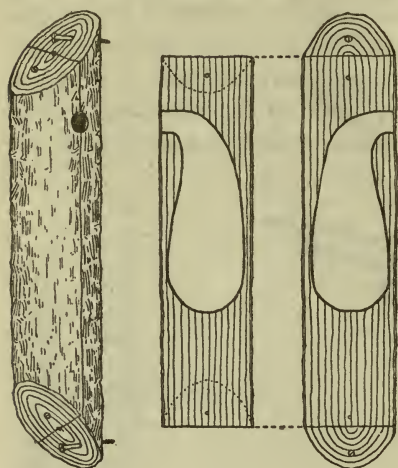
Log split and halves marked to be gouged out to form a cavity. Halves to be screwed together. Top should be covered with tin or zinc.
